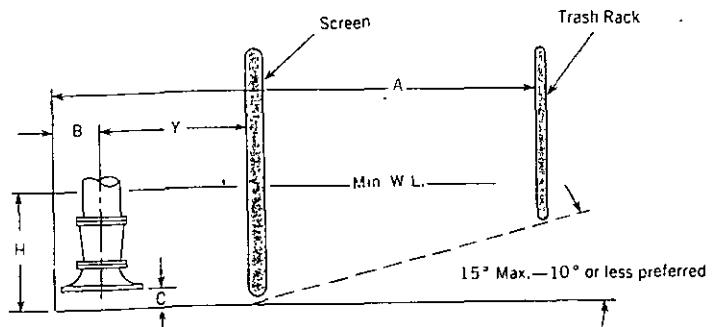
SUMP DIMENSIONS ELEVATION VIEW
